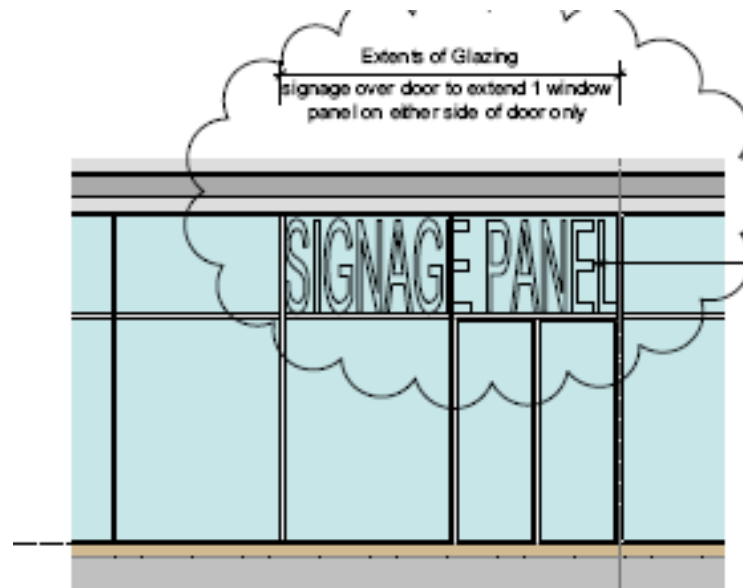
Elevations of the proposed hamper signage for the ground level tenancies. Signage to be affixed to inside face of glazing.
